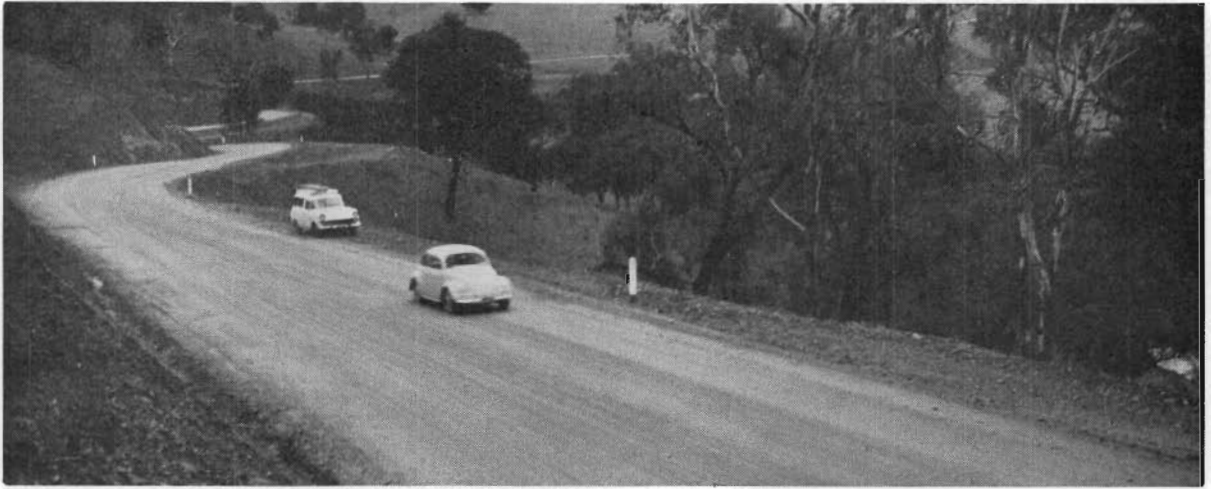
Murray Valley Highway Section I. Reconstruction and widening at Mt. Alfred Gap. Towong Shire.
